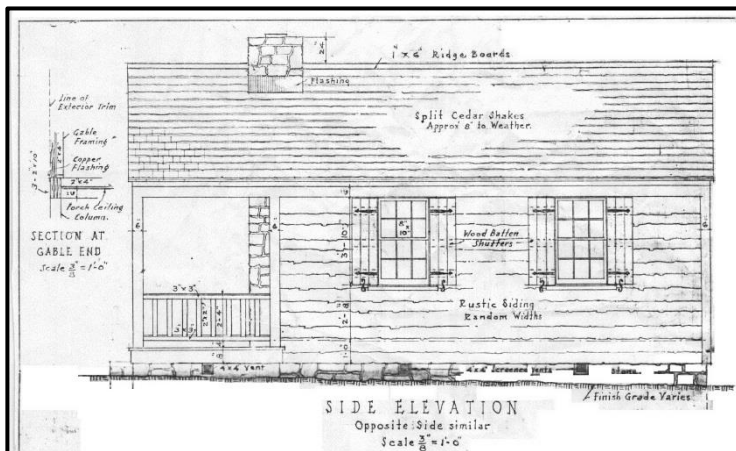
Side Elevation, Observer's Cabin, State of New York Conservation Department (Detail from Sheet 1 of 4) (NYS DEC)
